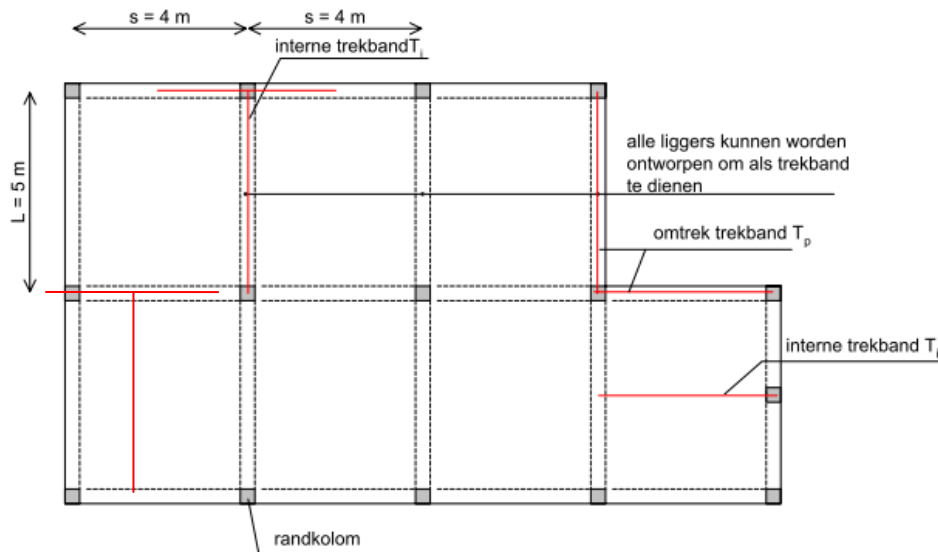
Example of an internal and external tension tie [Stufib 2006]
